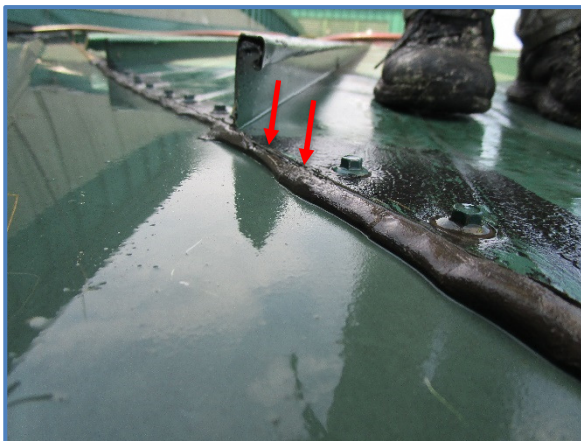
During the nozzle testing, bubbles occurred at the sealant joint between the roof panels and the valley pan (Red Arrows) indicating water is getting under the roof panels past the sealant joints.
